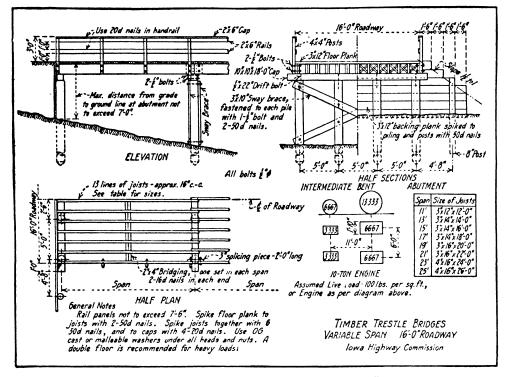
TIMBER TRESTLE BRIDGE. IOWA HIGHWAY COMMISSION.
